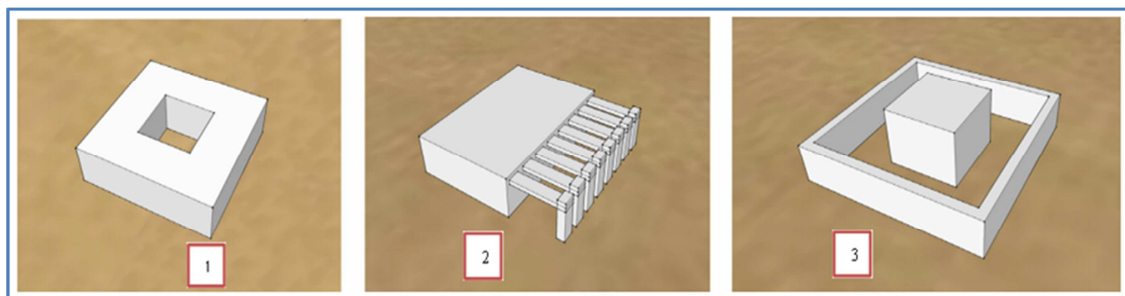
Type (1) open space inside the building, type (2) open space attached to the building, and type (3) the open space encloses the building (Taleghani et al., 2012).
